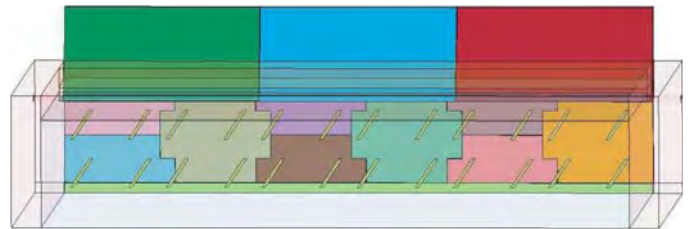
Rebars detail in N.J. barrier and moment slab.
